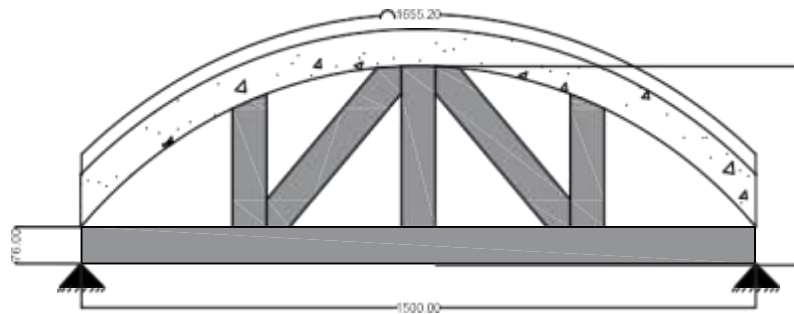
Typical shape of a composite steel-concrete arch specimen.
